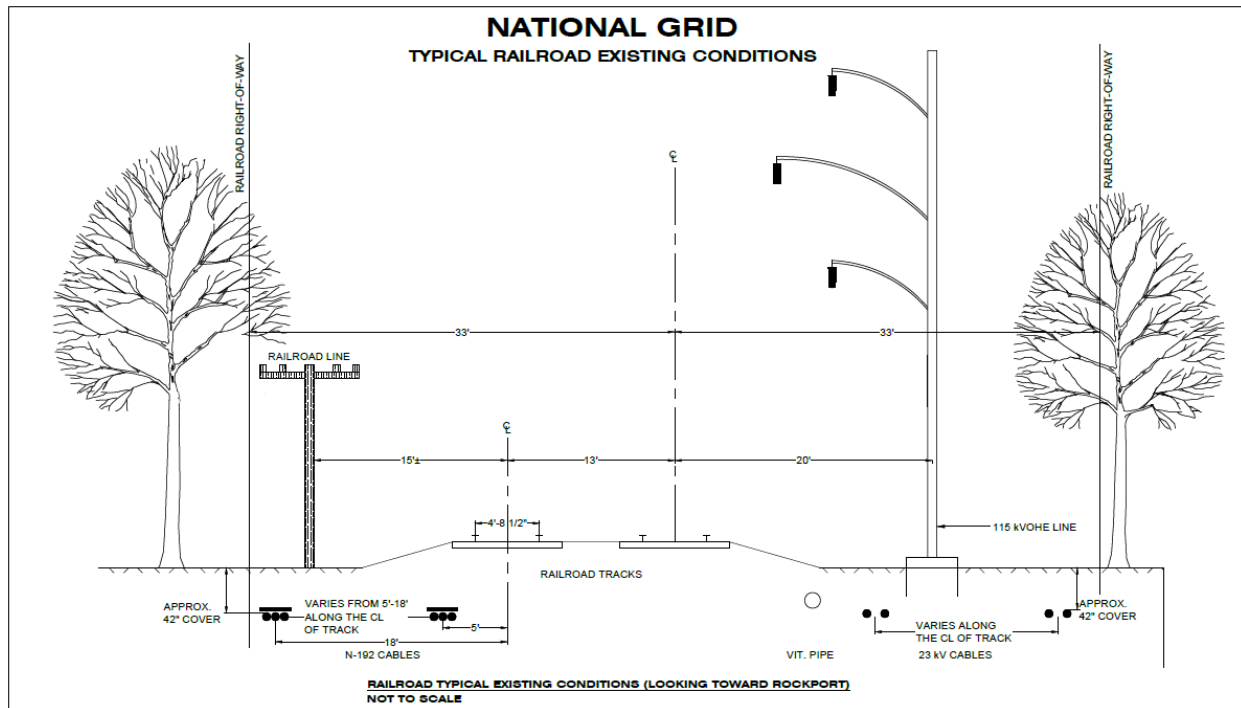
Cross Section of Typical Railroad ROW with Existing Conditions
